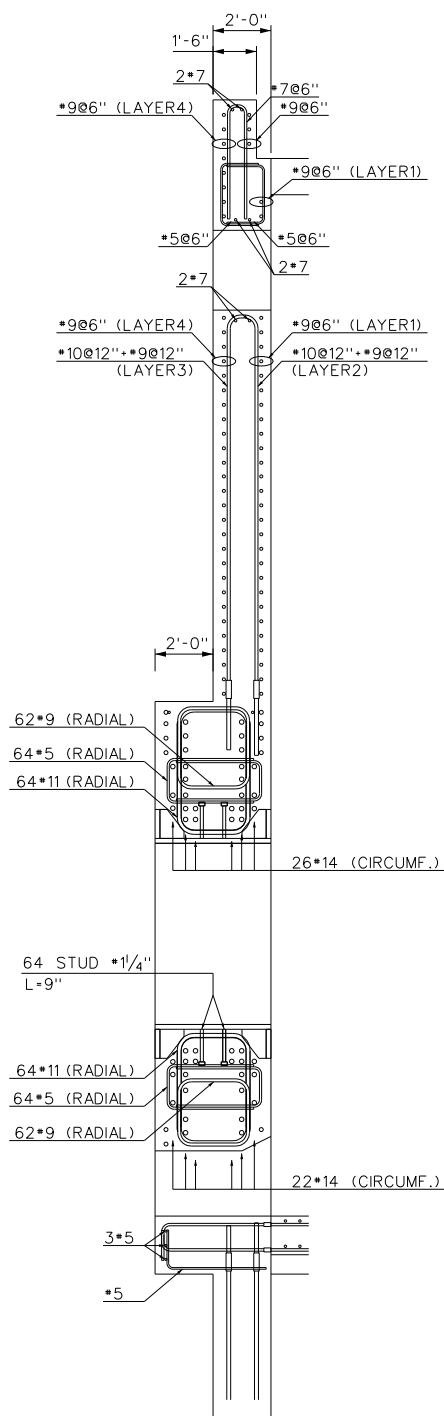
H.5-5 (Sheet 2 of 3) [Concrete Reinforcement Layers in Wall 11 (Looking East)]
